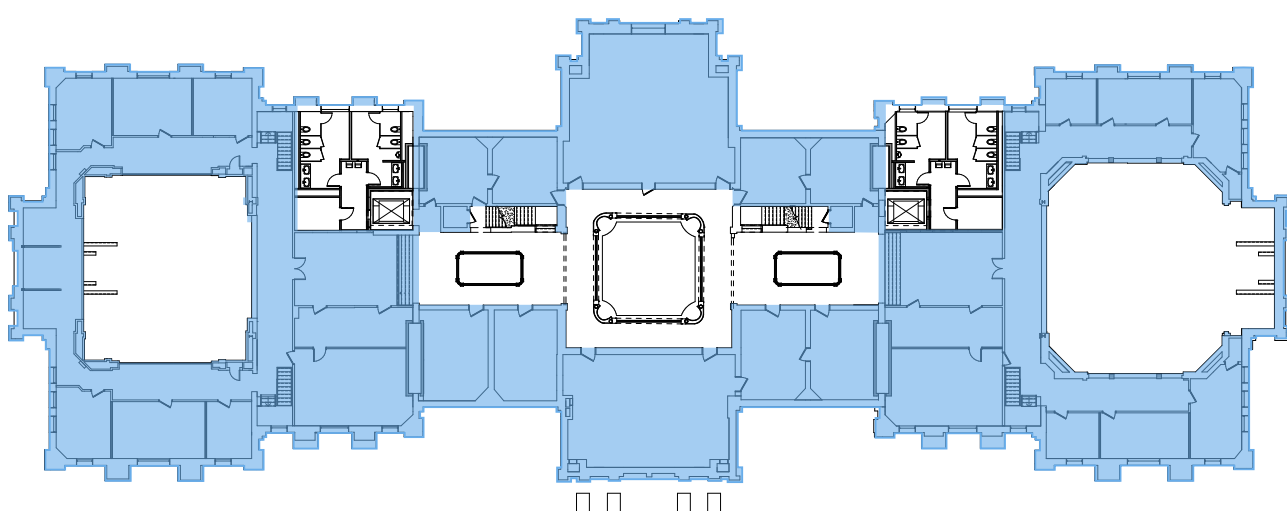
Proposed Space Allocation: Legislature and LSO - Third Floor [Capitol]
